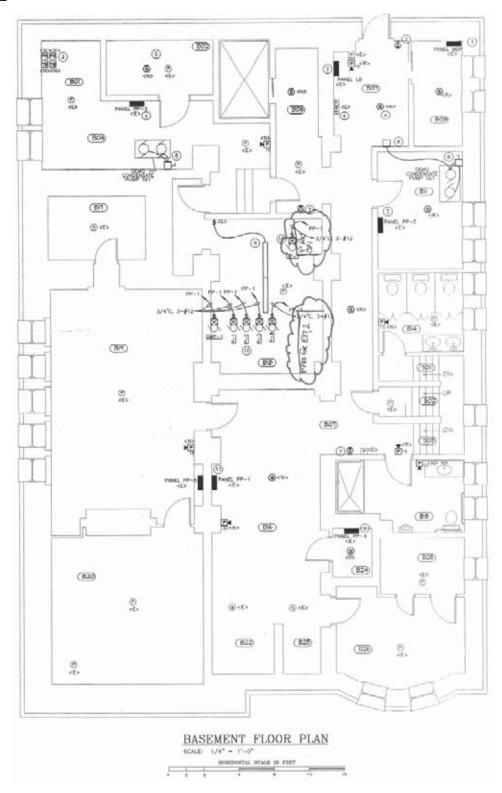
Plan from September 2004 Mechanical Systems Improvements; Plan E1 (N.T.S.)
